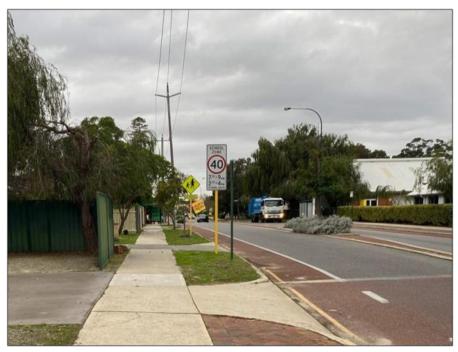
Existing footpath and cycle lanes along Thelma Street outside the subject site
